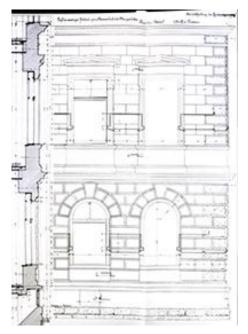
Ober-Realgymnasium in Banja Luka; section detail between ground and first floor with cornices between [9:table 3]
